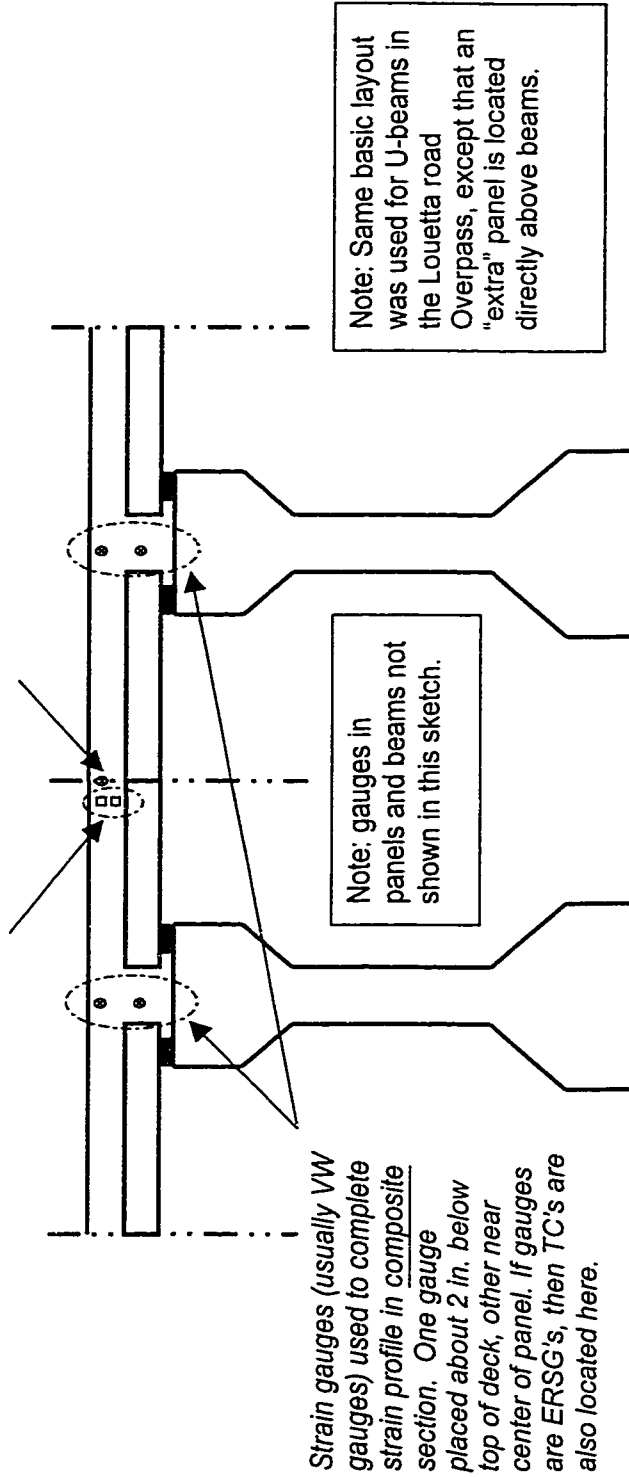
Typical Instrumentation Scheme for Cast-in-Place Bridge Decks
